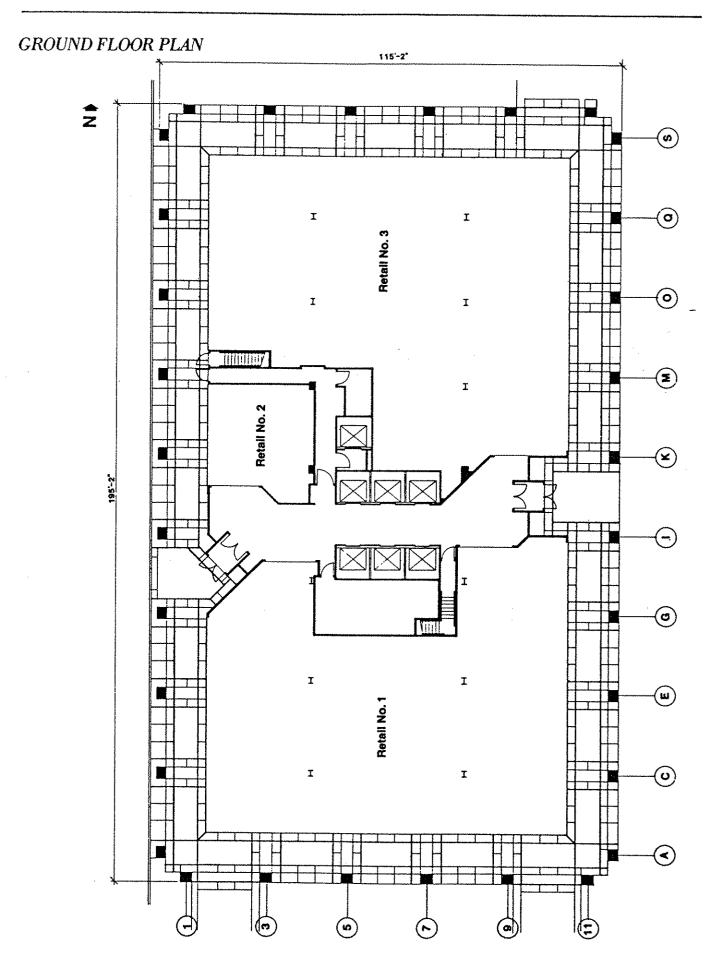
TYPICAL ONB PLAZA FLOOR PLAN
